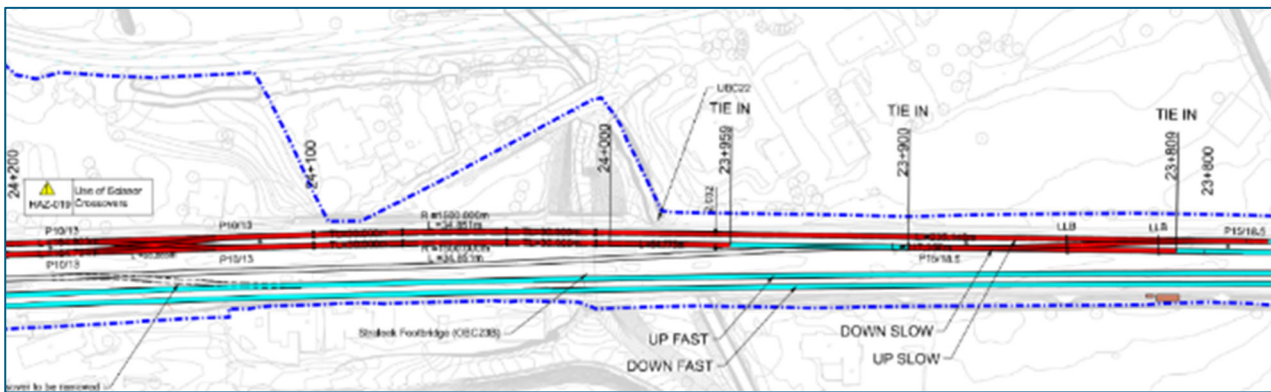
Hazelhatch & Celbridge Station – Track Plan Layout (3 of 3)
